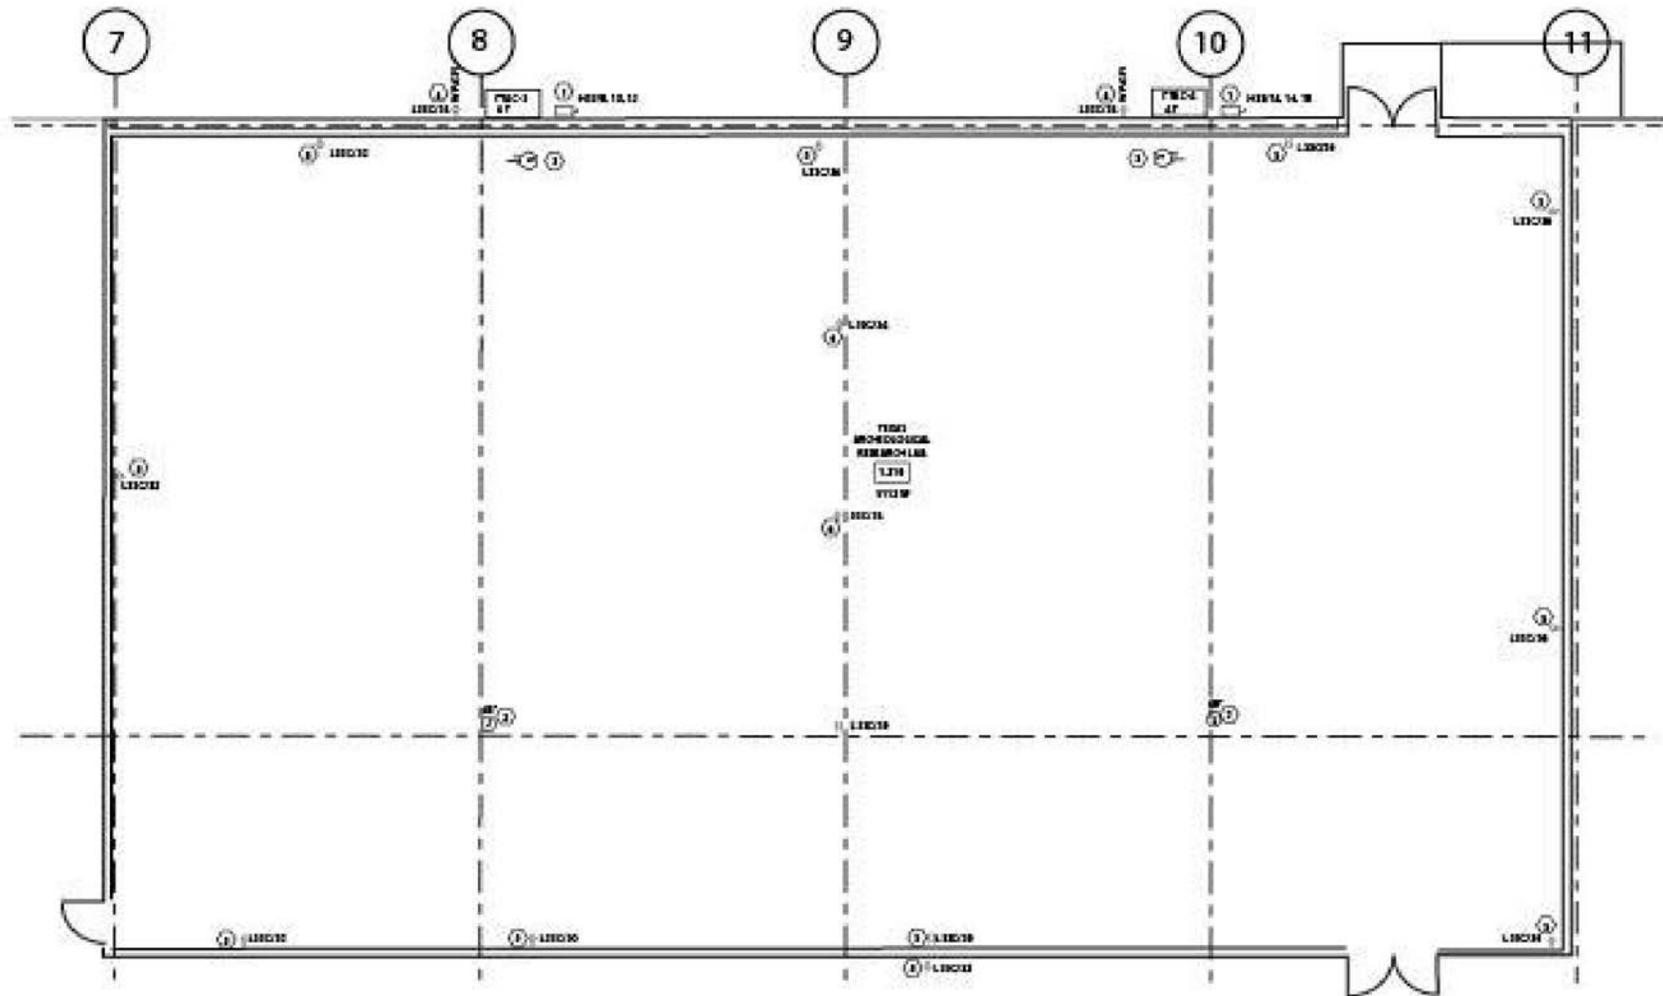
Building 33 Bulk Storage area after renovations including HVAC.
